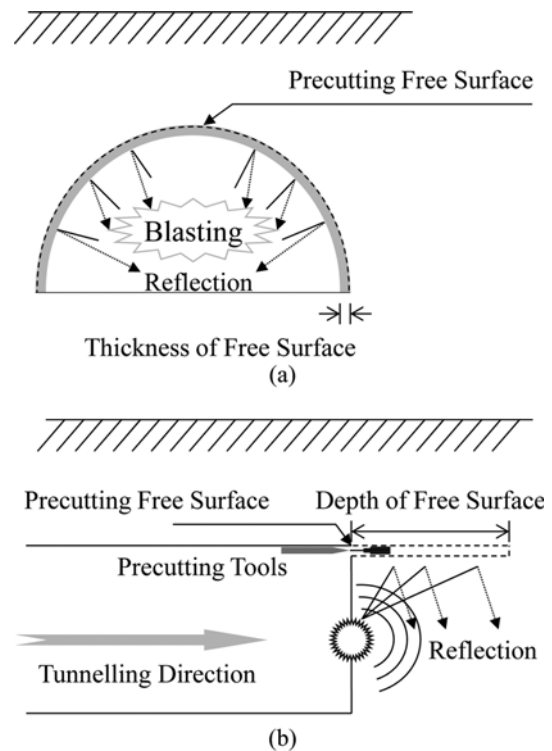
Tunnel Blasting System with Precutting of Tunnel Perimeter for Reducing Blasting-induced Vibration and Damaged Zone: (a) Transversal View, (b) Longitudinal View
